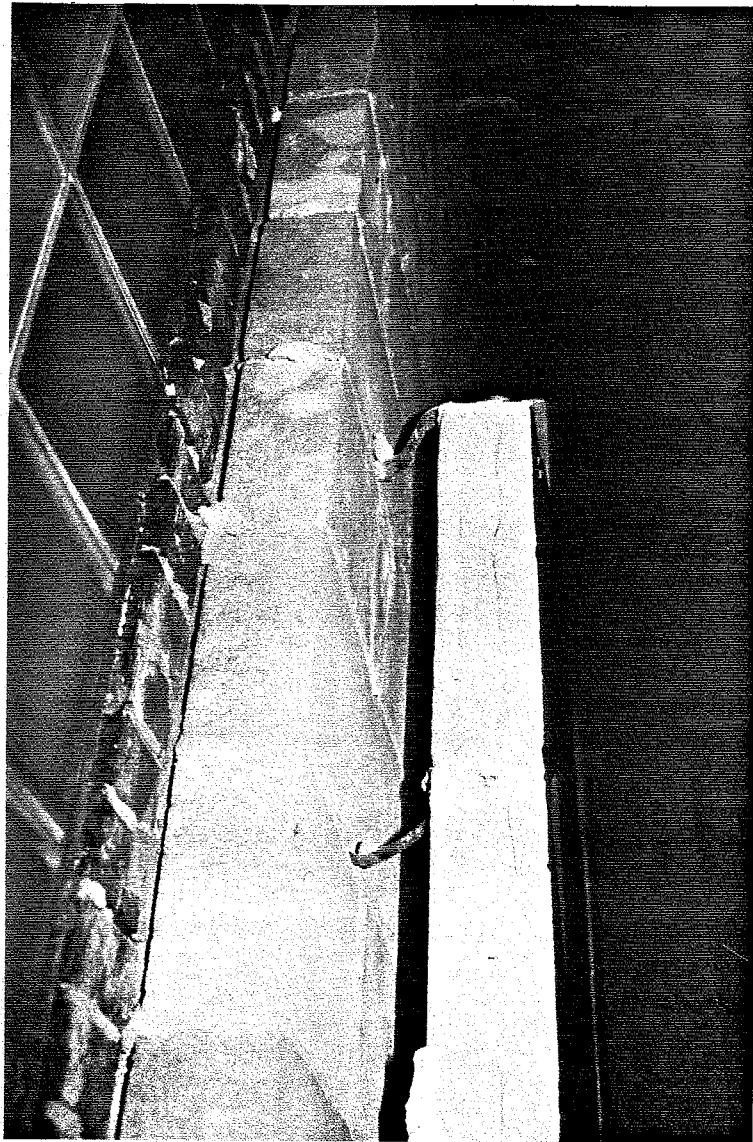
Ineffective tension ties between decorative wall and back-up wall.
